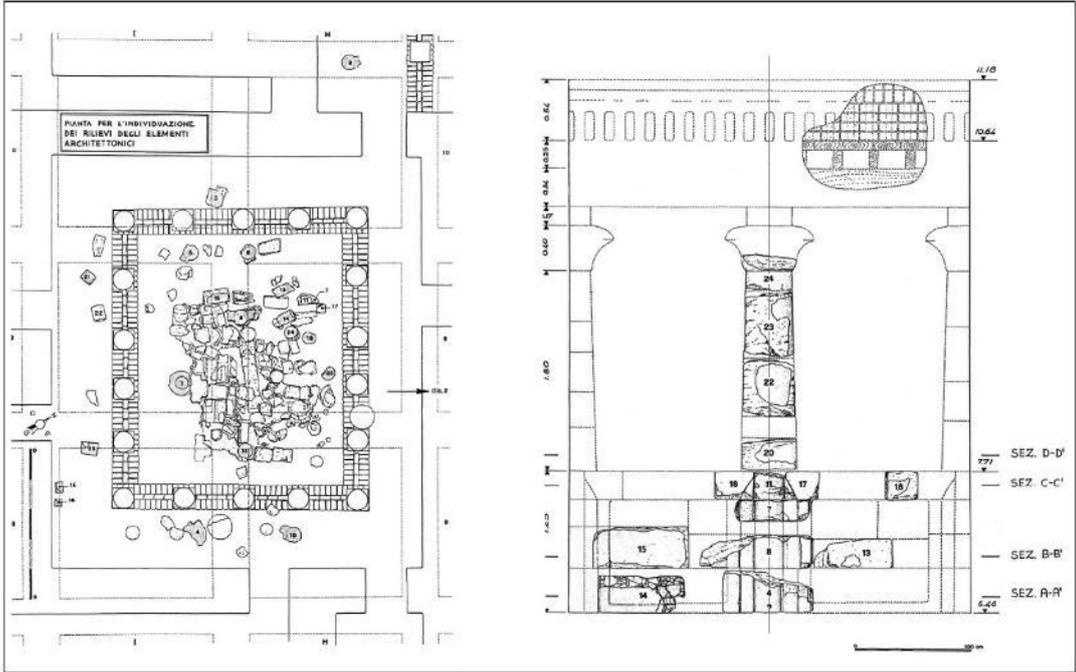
Right: reconstruction of the elements making up a column together with parapet wall of the upper level of the structure. Left: the plan of the tumble with the numbers connecting the elements to the related original position supposed on the reconstruction (from BARBERINI 2010).
